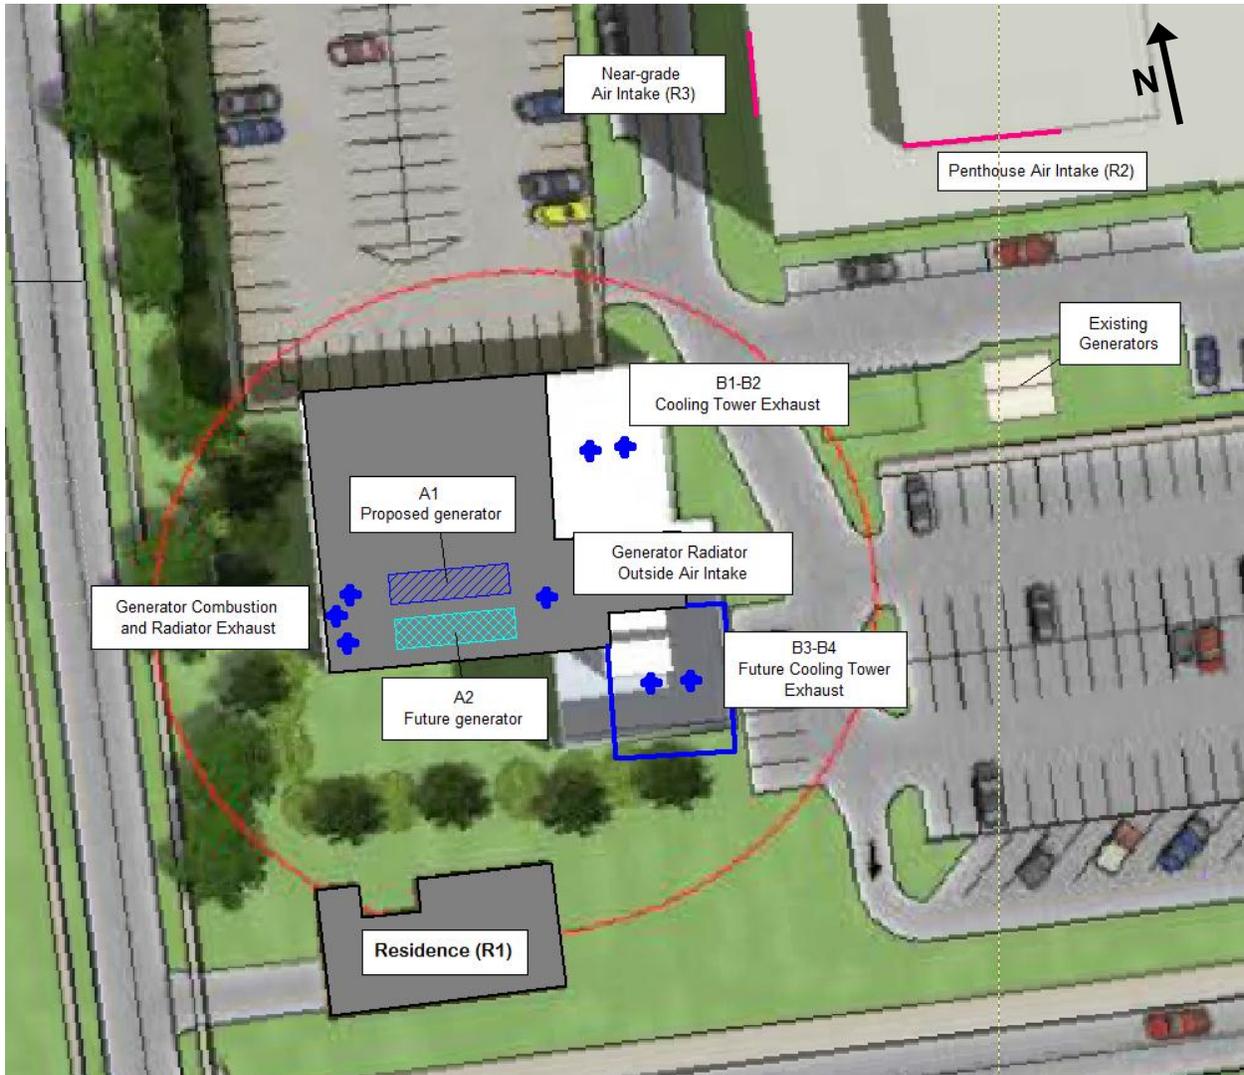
Plan Sketch of Equipment Layout for New Energy Plant
